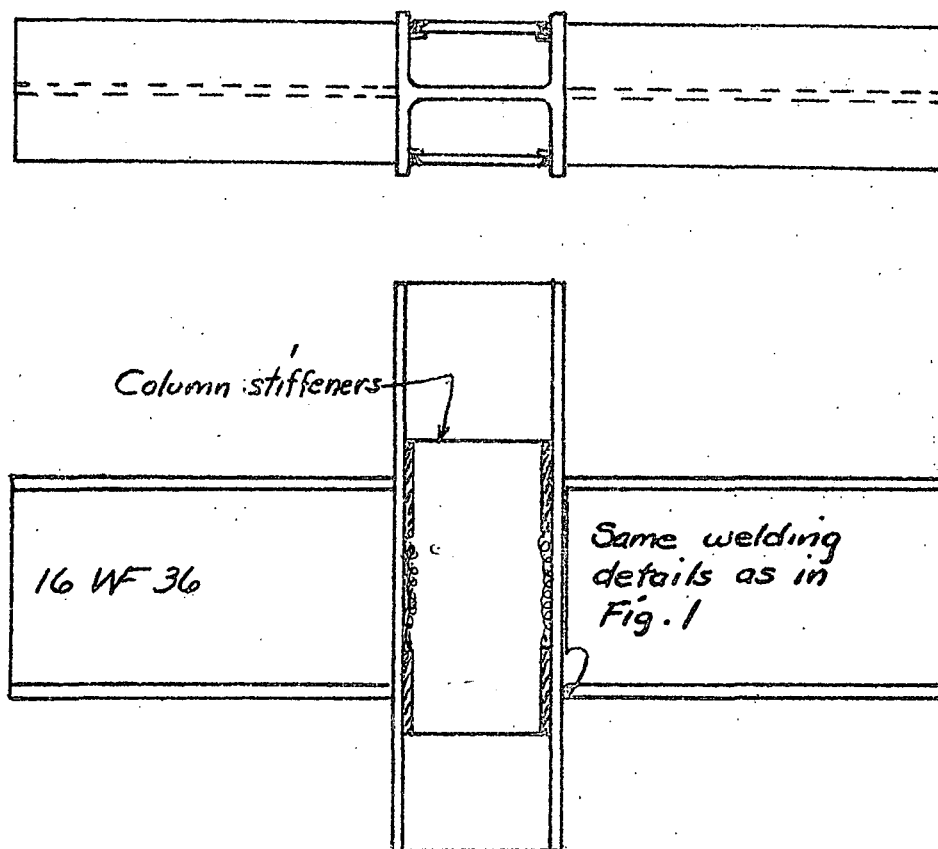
B. COLUMN STIFFENERS PARALLEL TO WEB OF COLUMN
